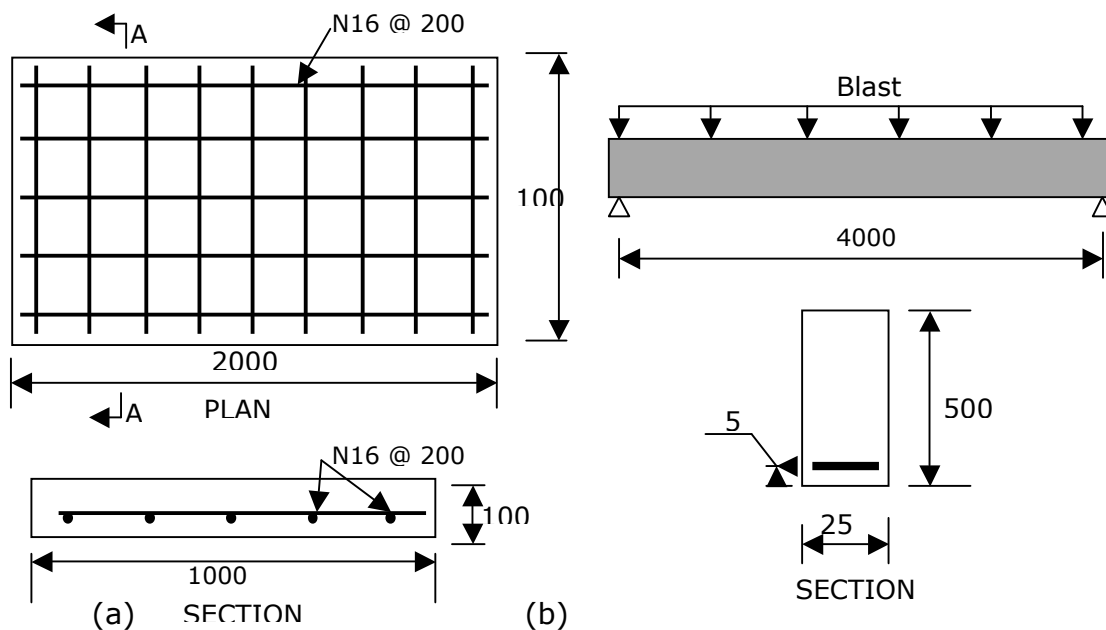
Geometry and reinforcement details of the a) Panel b) Beam
